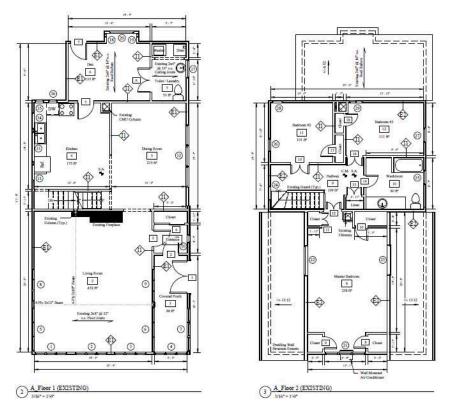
Floorplans of existing first and second floors, 869 Sangster Avenue. (Image from owners.)
